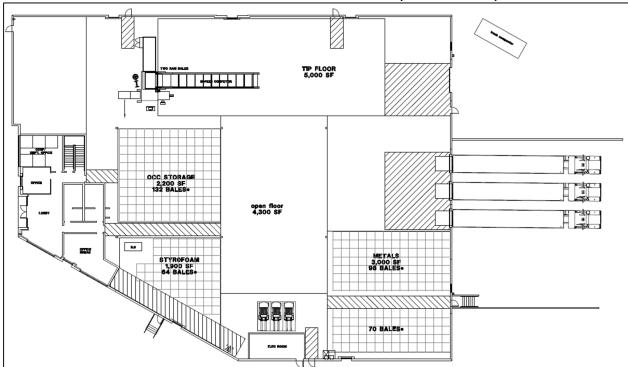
PROPOSED FLOOR PLAN (BUILDING #3)
